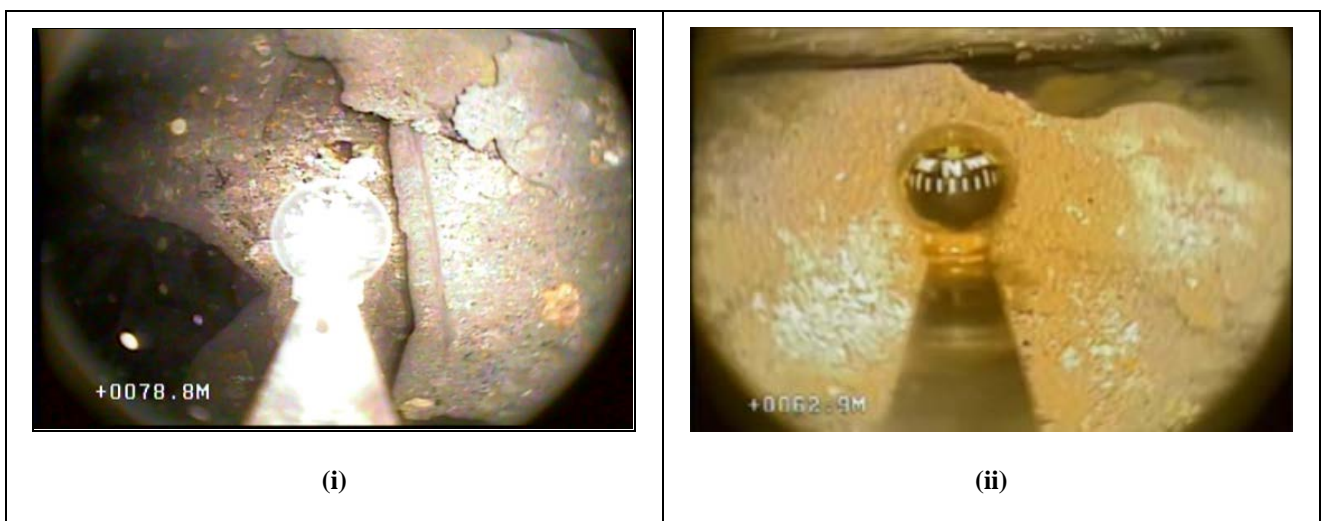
Downhole CCTV camera images showing (i) rubble (collapsed mine roof) on the floor of abandoned mine workings, and (ii) grout in contact with the roof of mine workings
